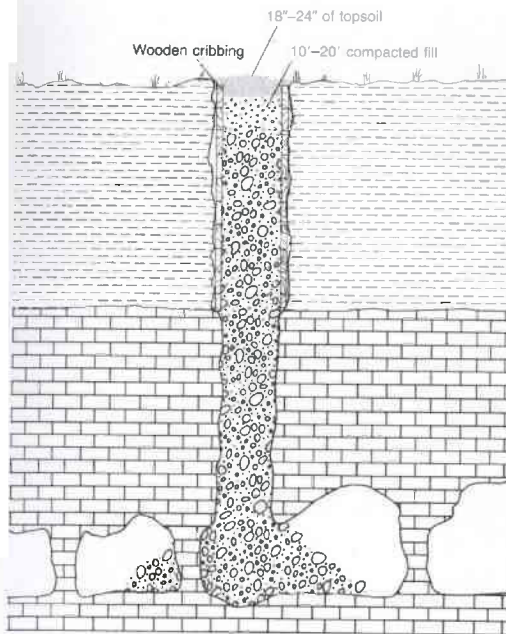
Schematic cross section of open mine shaft, illustrating one way to seal or close the opening in early stage of shaft failure.
